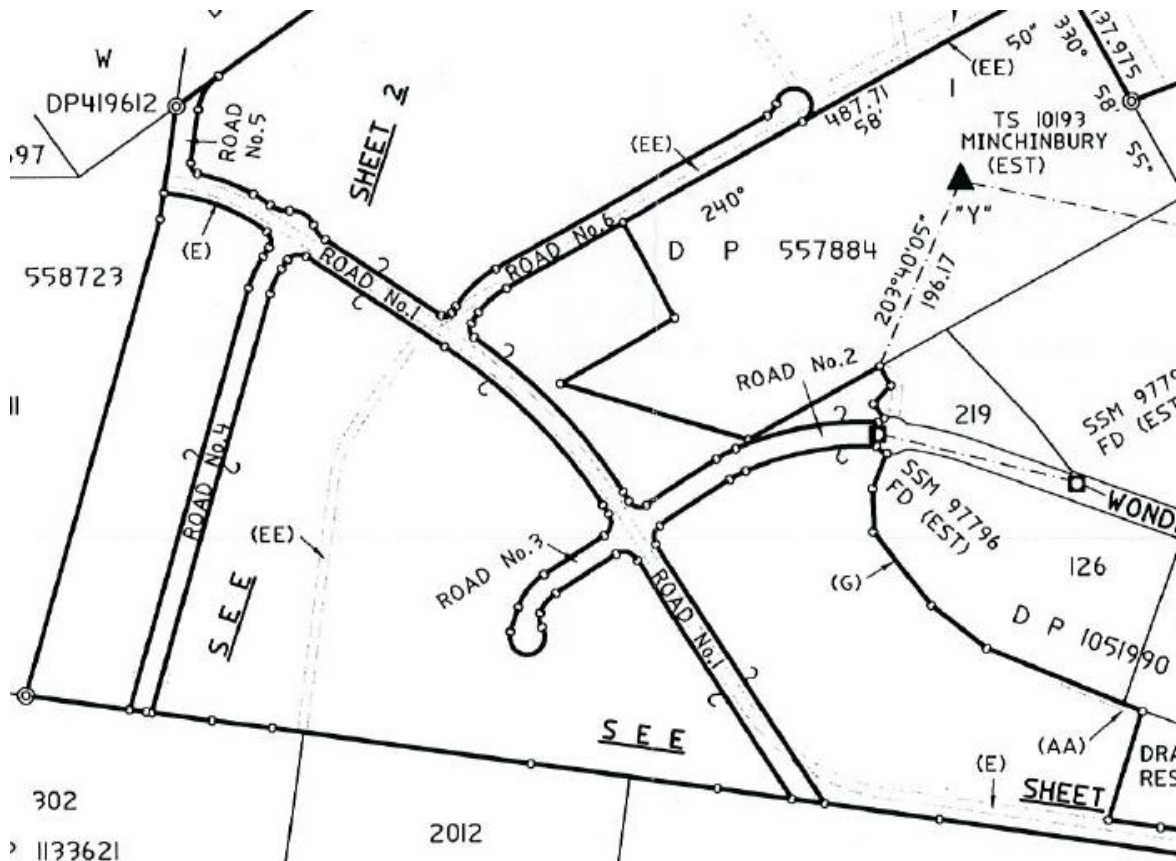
Approved road layout Stage 3 (S.96 09-1535)
